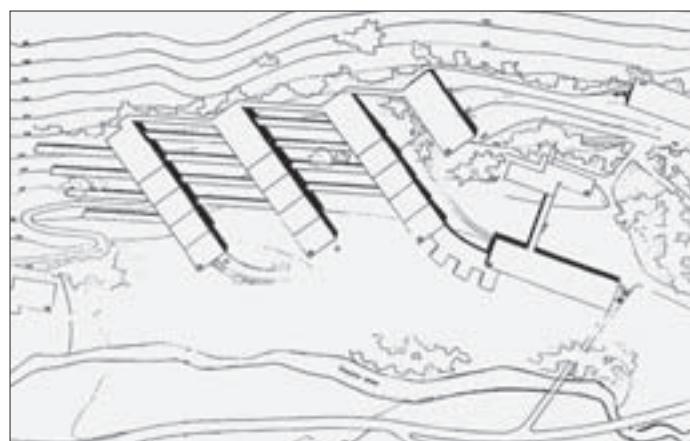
Z. DUMENGJIĆ: PAVILION COMPLEX OF THE STATE TUBERCULOSIS SANATORIUM FOR CHILDREN, DESIGN, GROUND FLOOR AND FLOOR PLANS, 1936-38
